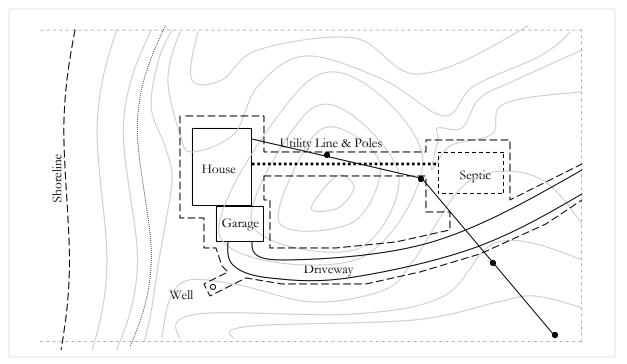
Site plan in dune slope areas with excavation impact area delineated.
